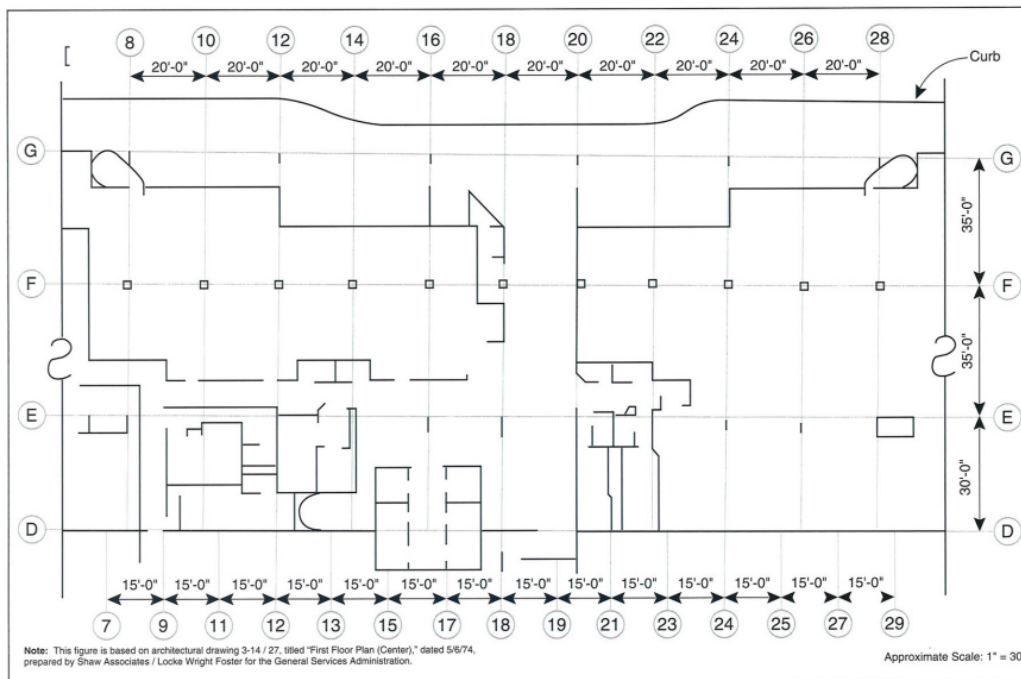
Plan view of first floor north face (Source: www.fema.gov)
